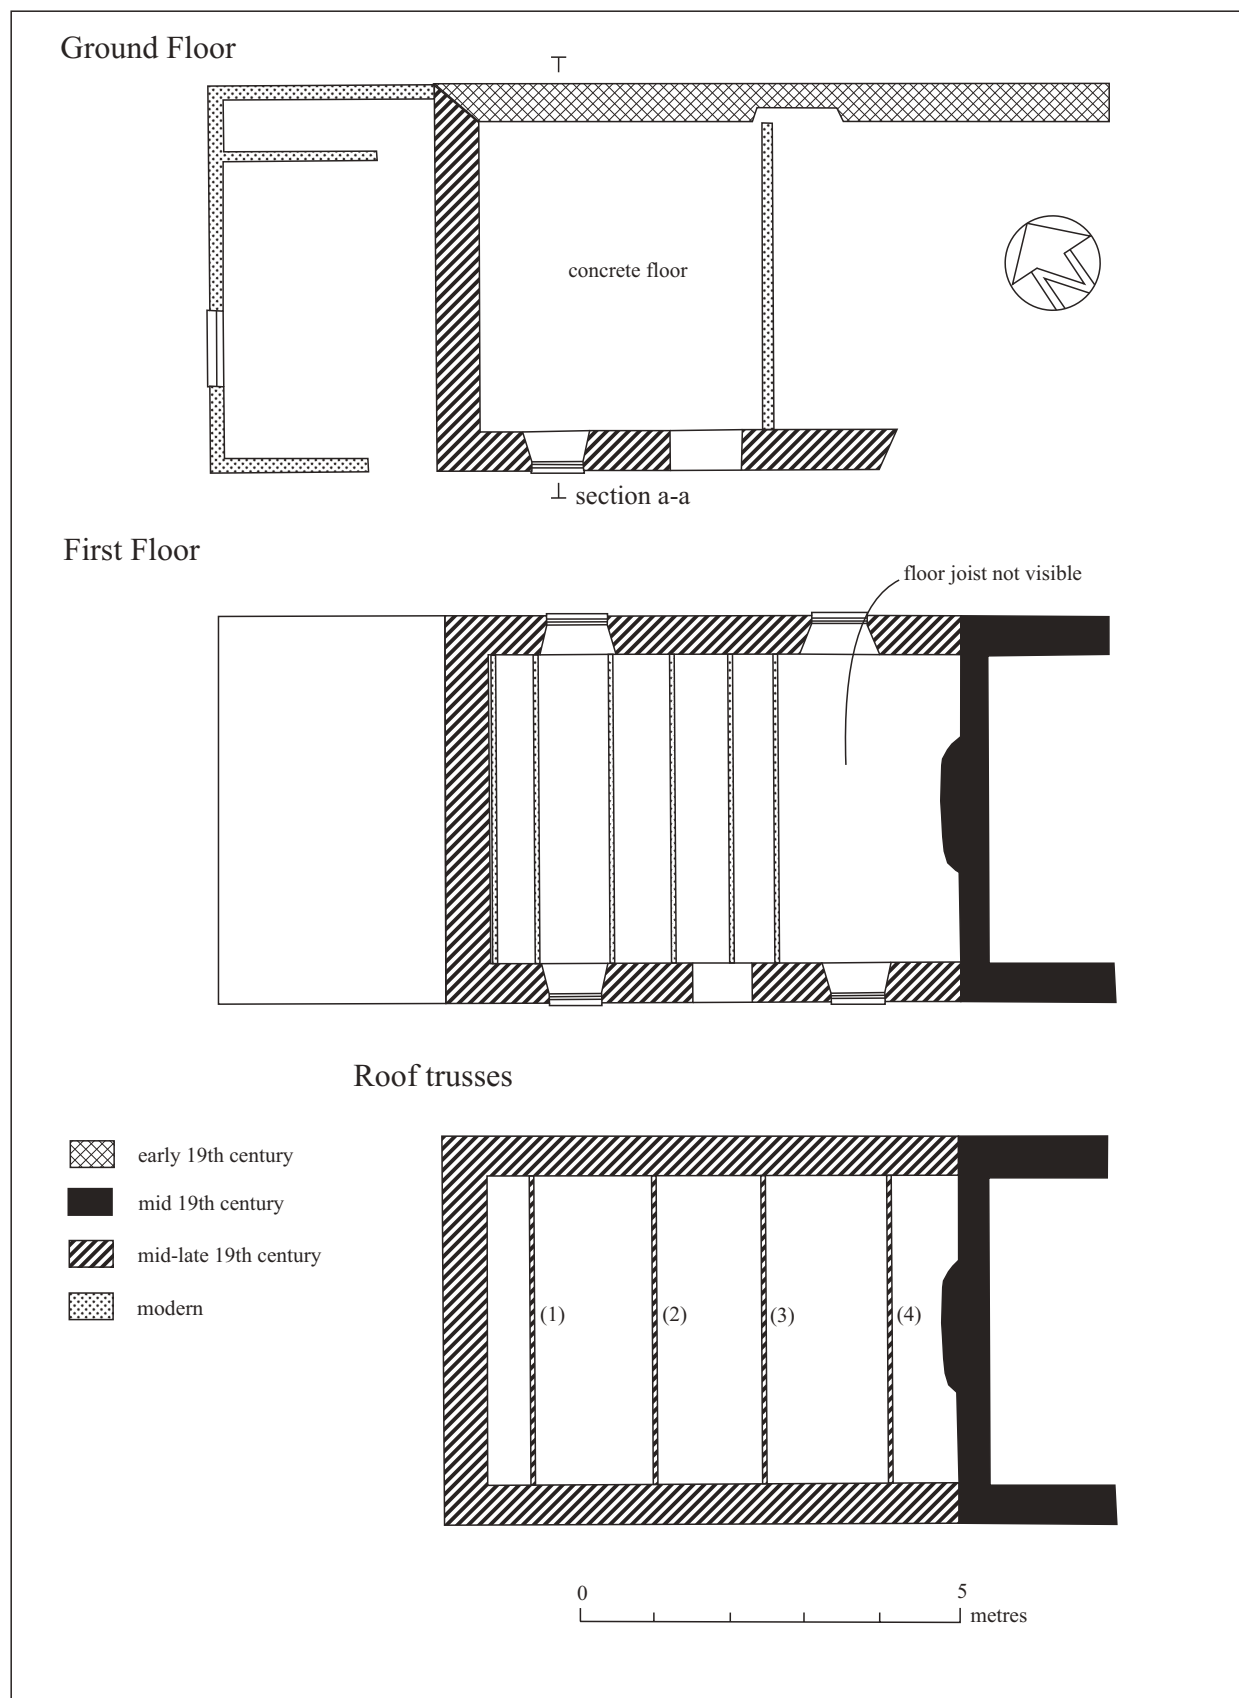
Plan of building showing location of observations and suggested phases of development.
